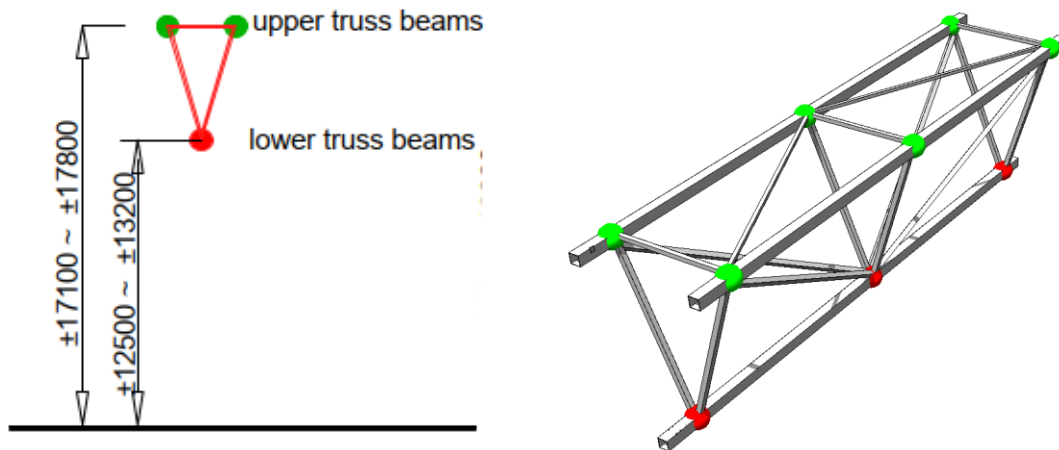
South Hall suspension points upper (●) and lower beam (●) in cross-section and isometry
